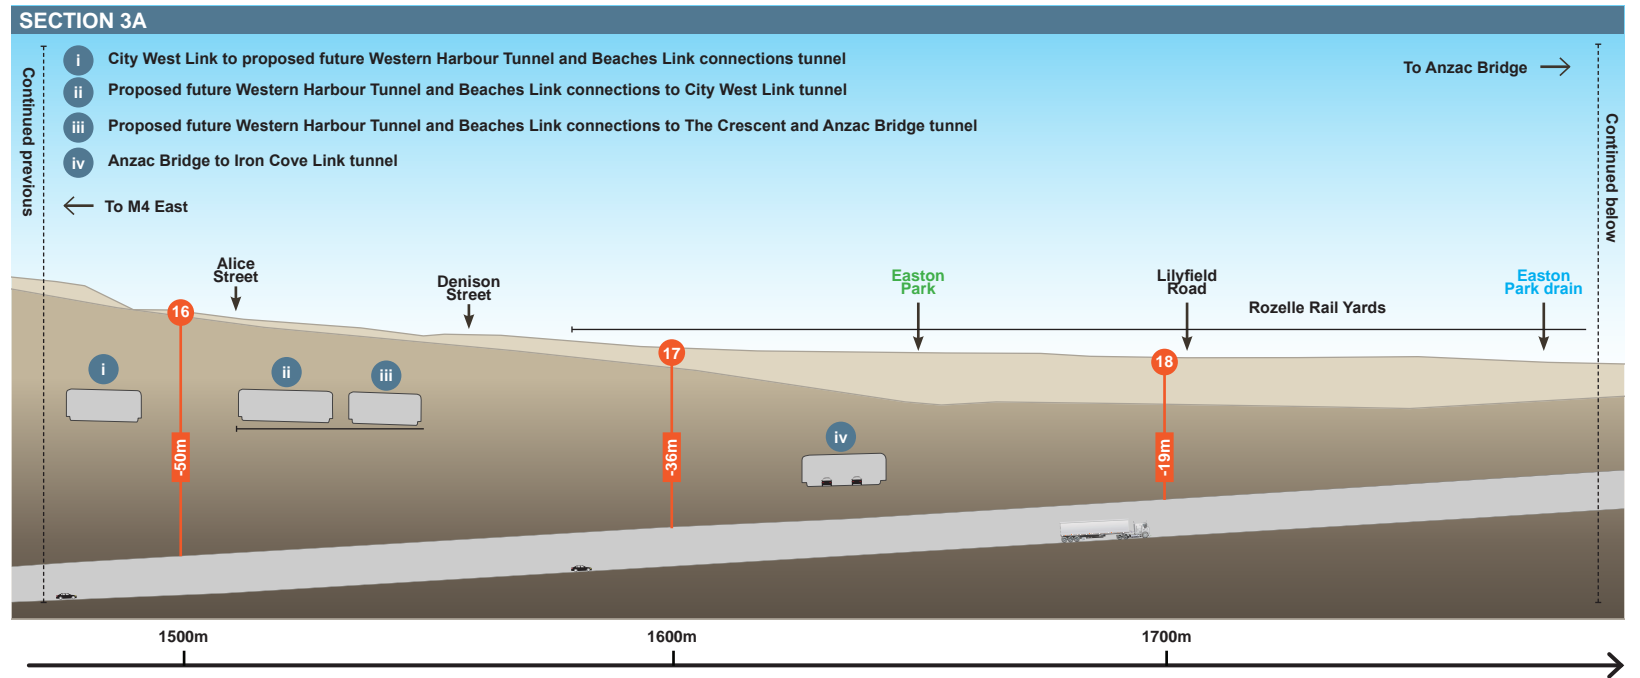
Geological long-section - M4 East to Anzac Bridge - Section 3
